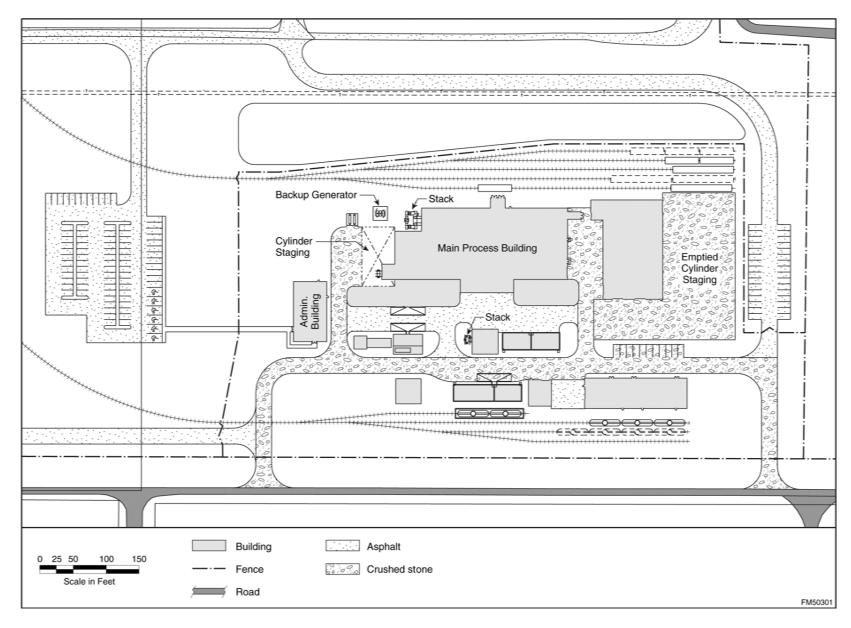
Conceptual Conversion Facility Site Layout for Paducah
